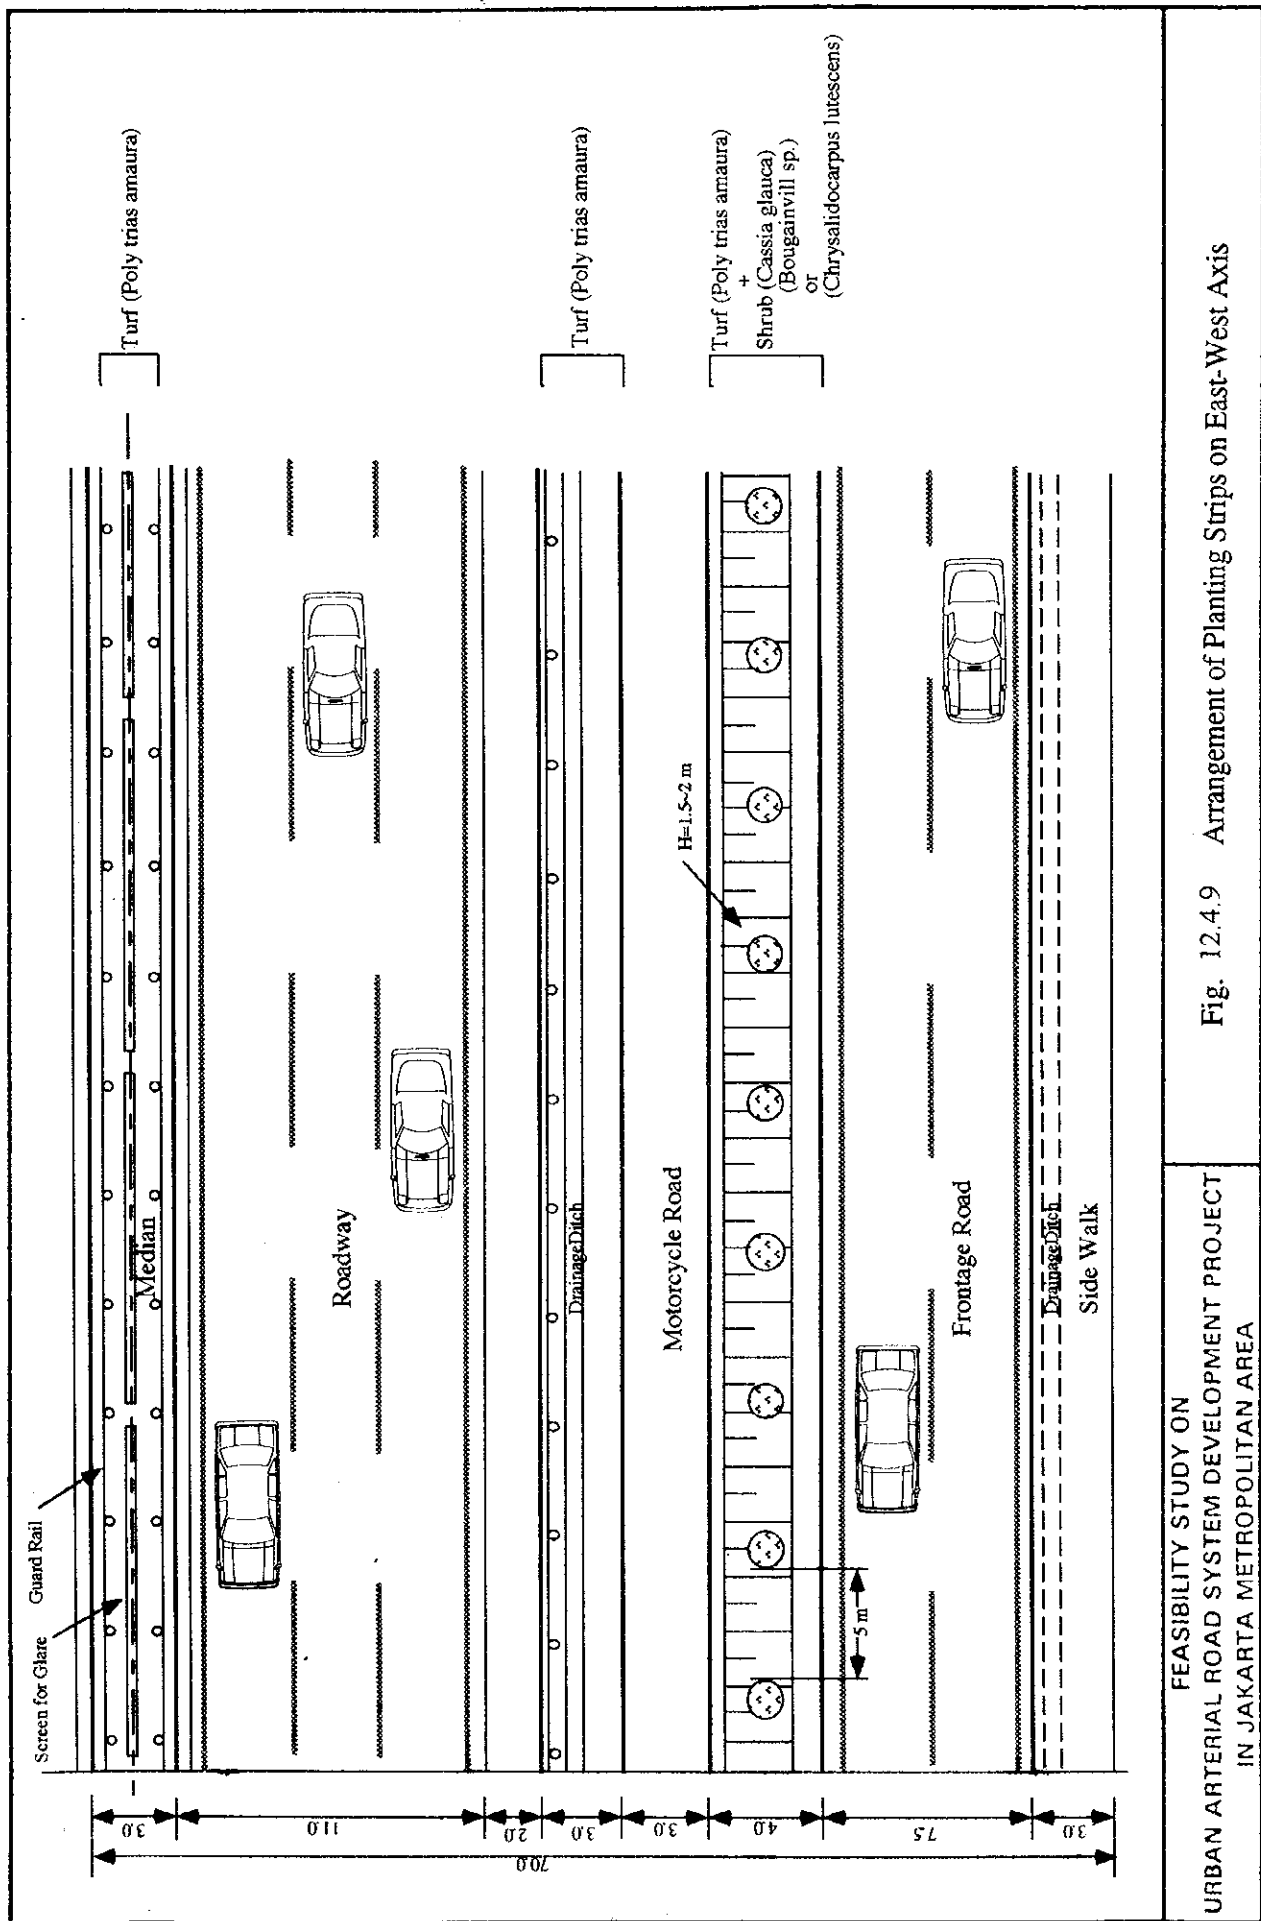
Arrangement of Planting Strips on East-West Axis
